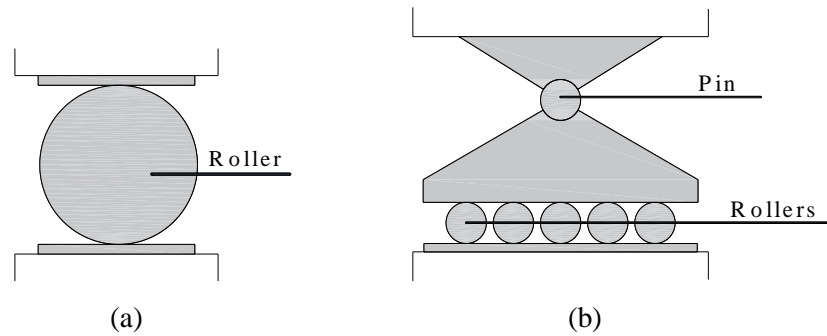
Sketch of (a) single roller bearing; (b) multiple roller bearing.
